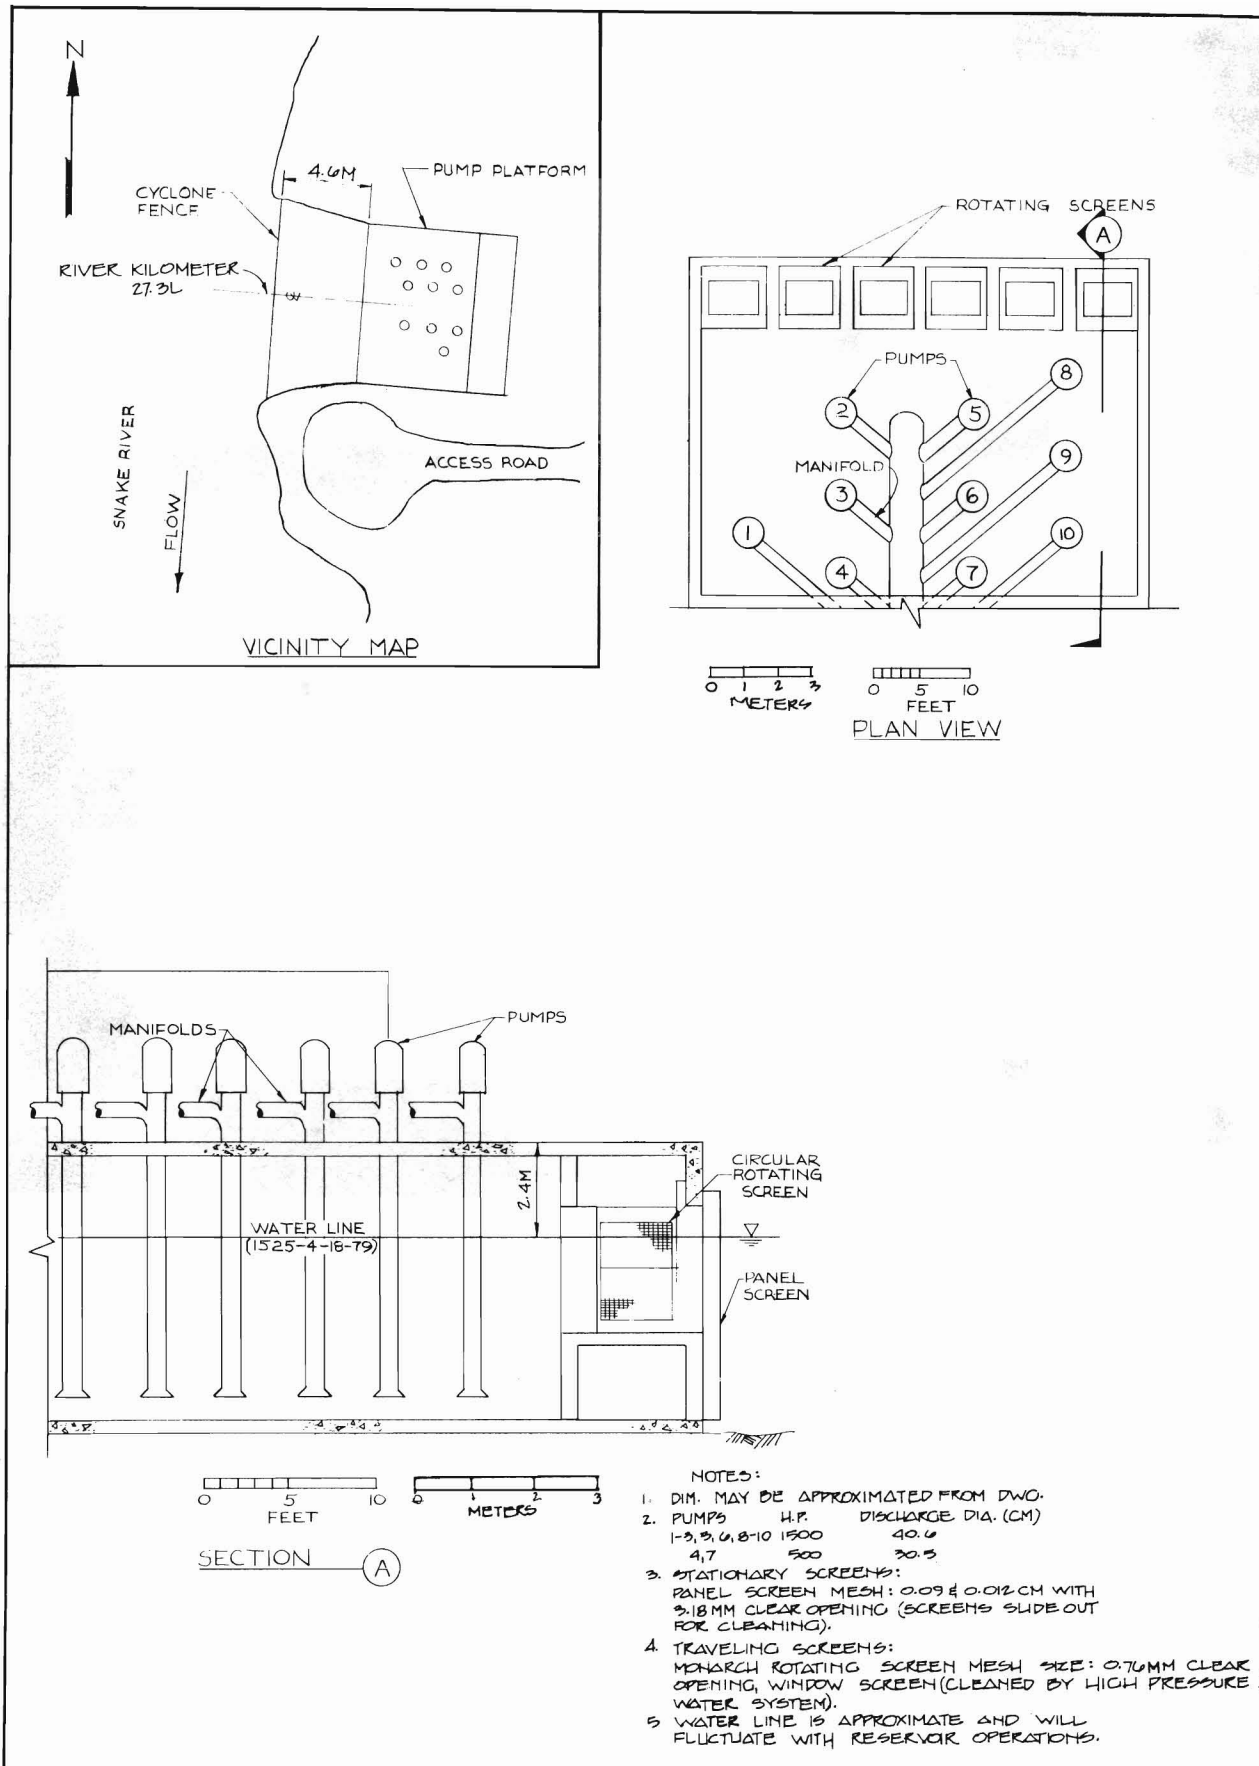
Water withdrawal plan, K2H Farms, Inc. (river mile Snk017.0L).
